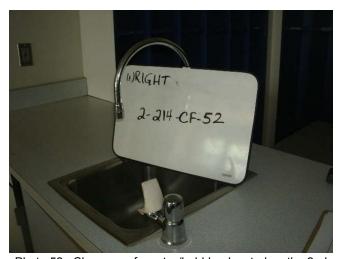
Classroom faucet w/bubbler, located on the 2nd floor, in room 214.
